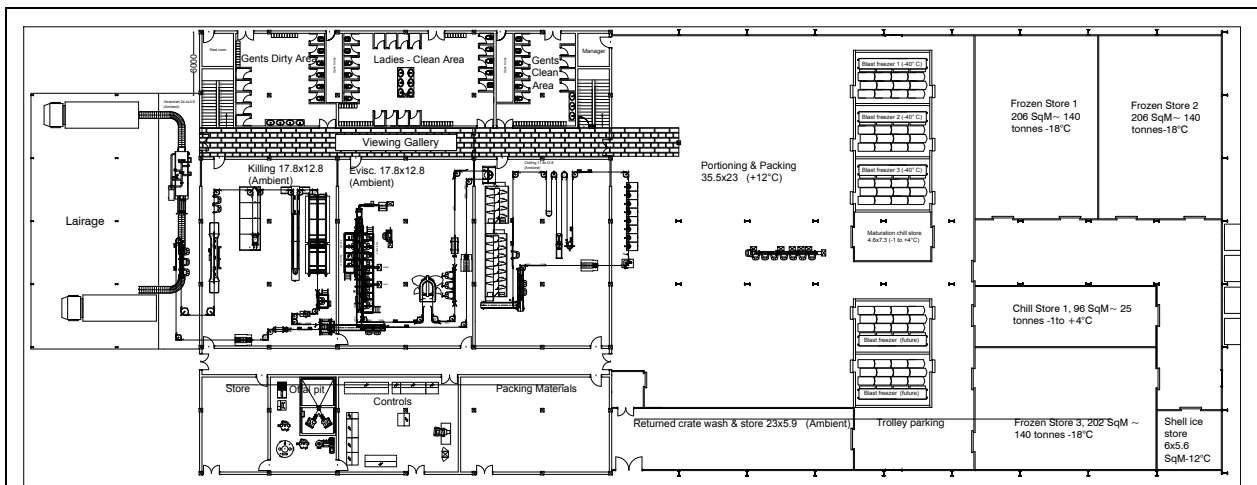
A 2500/6000 BPH processing building drawing showing the starting configuration. When you compare this layout drawing with the one shown in figure 35 you will notice that since the initial equipment placement was done right, expansion can occur with a very small downtime.
